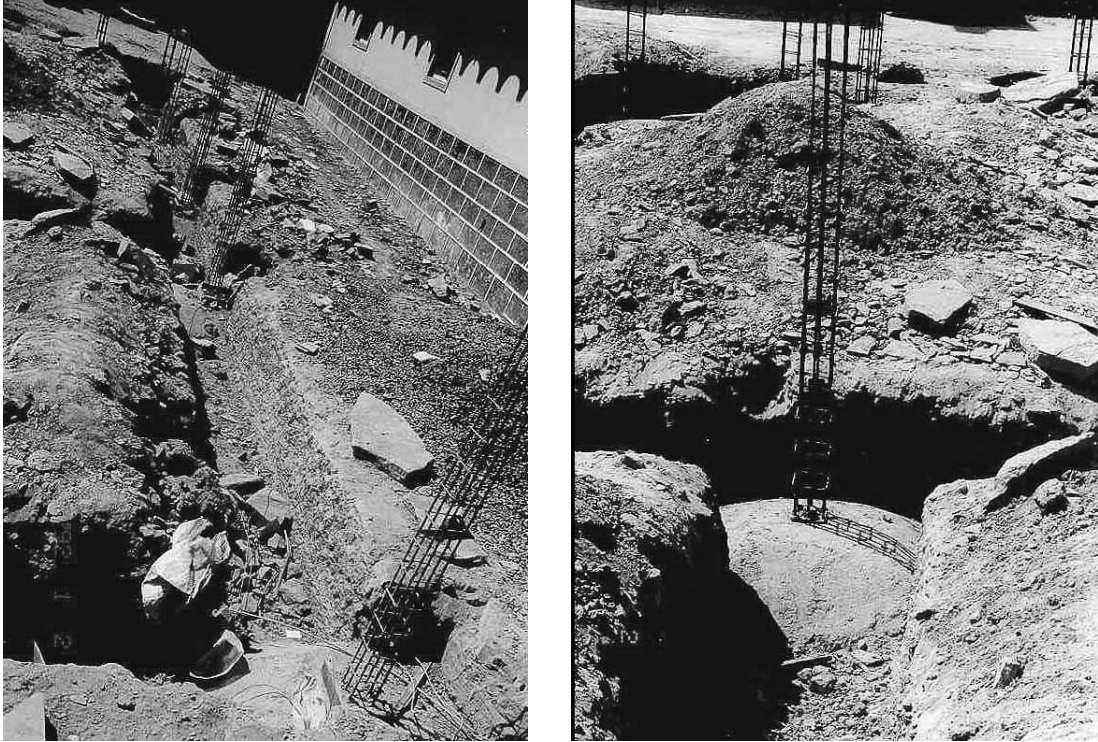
Poor reinforcement detailing for an Reinforced Concrete frame building about to be constructed in Sukhpur
